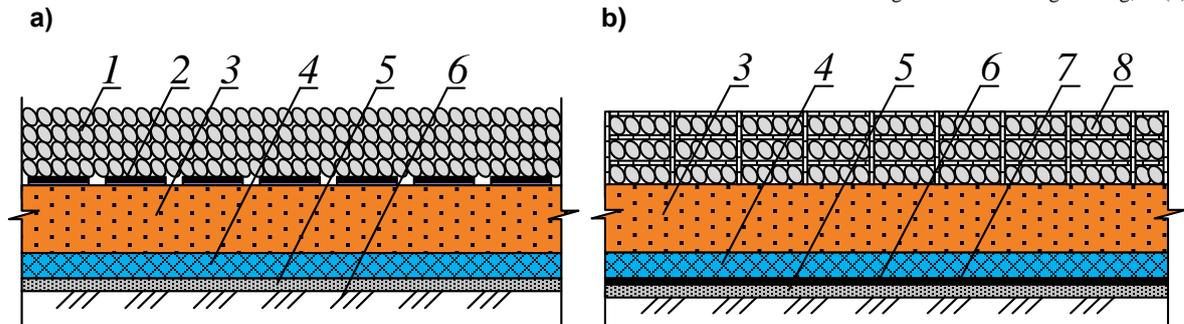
Multilayer constructions of seepage-control coatings with geosynthetics for canals and ponds: a, b – with a seepage-control element made of bentonite mats and a protective layer; 1 – a protective coating of rockfill; 2 – non-woven geotextile; 3 – a protective layer of ground; 4 – bentonite mat; 5 – the underlying layer of sand; 6 – compacted base; 7 – polymer geomembrane thermally bonded with a lower layer of bentonite mat; 8 – gabions filled with rocks.
